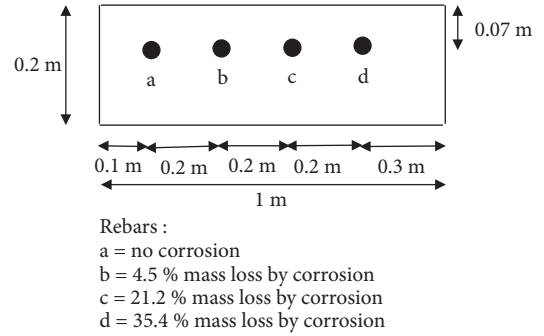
Schematic representation of concrete slab with rebars at different degrees of corrosion.
